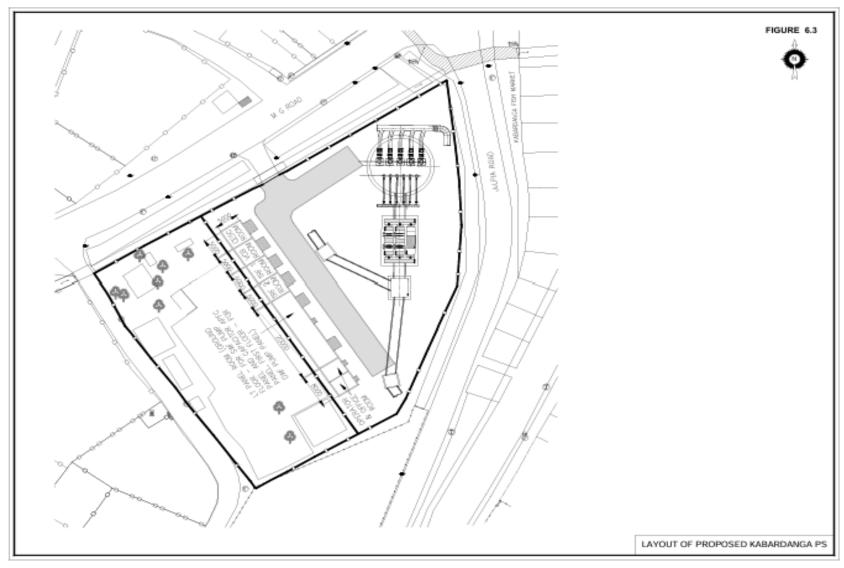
Layout Plan of Proposed Kabardanga Pumping Station (SD 07)
